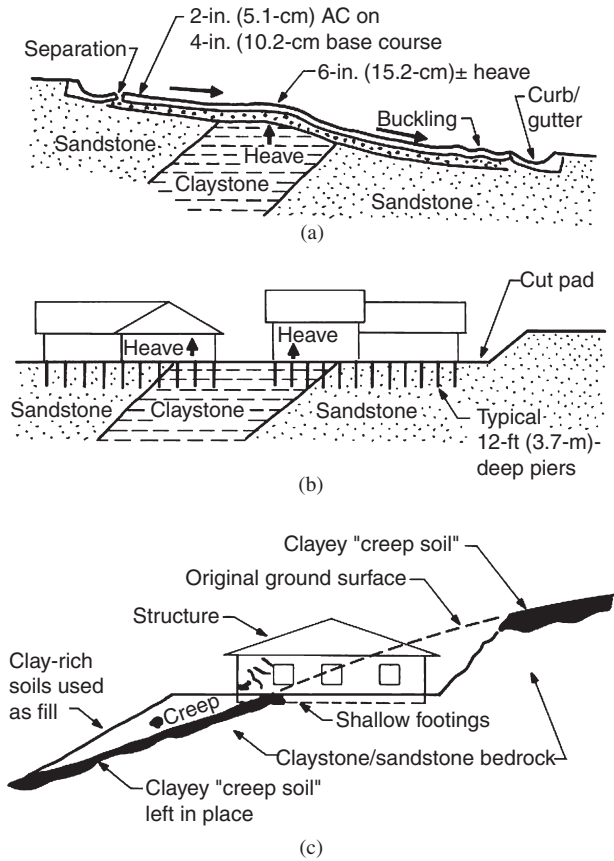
Problems of heave and creep in the interbedded claystones and sandstones at Menlo Park, California: (a) typical pavement damage; (b) damage to houses on shallow piers; (c) conditions resulting in creep damage. (From Meehan, R. L. et al., *Proc. ASCE J. Geotech. Eng. Div.*, 101, 1975. With permission.)
